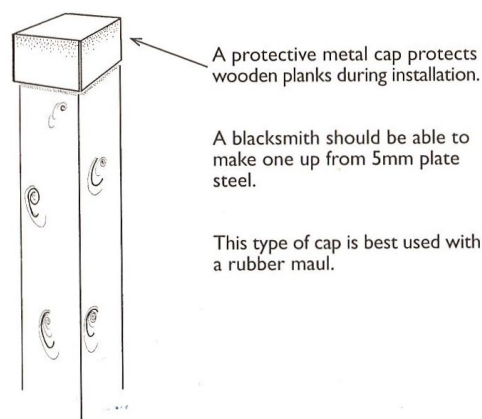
A protective metal cap used to stop planks splitting and cracking when they are hammered into the peat.
